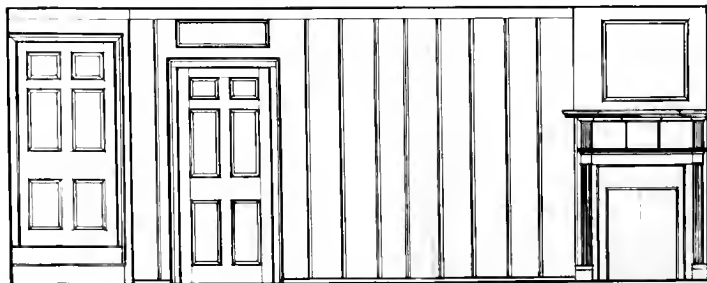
Library, North Elevation The north elevation incorporates an original door to the staircase, a door to the east hallway and random width feather board across.
